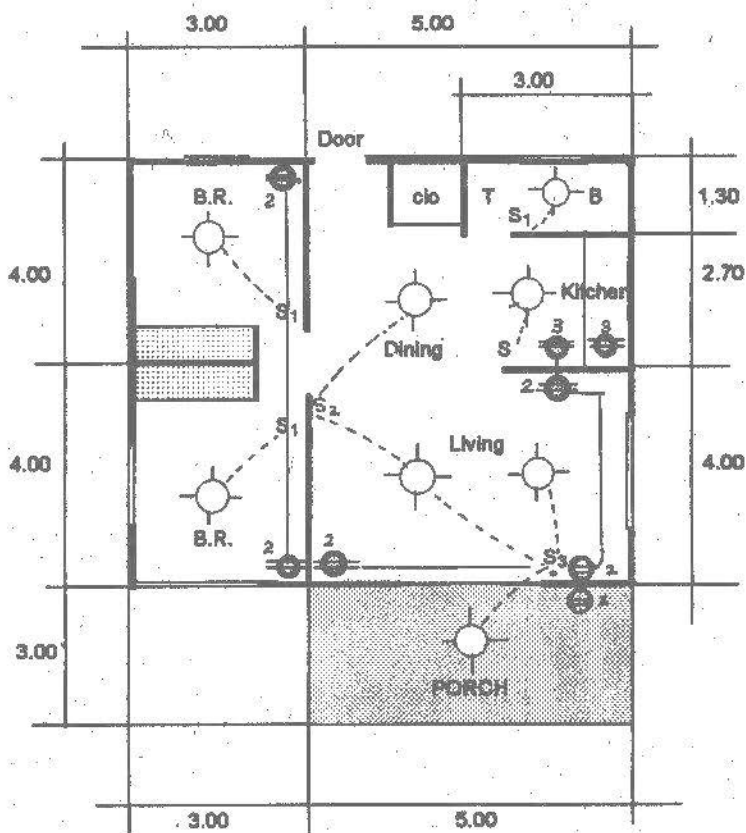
CONVENIENCE OUTLET LAYOUT
